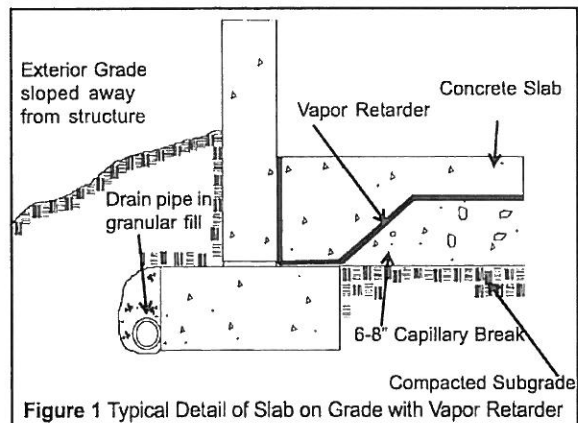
Typical Detail of Slab on Grade with Vapor Retarder
